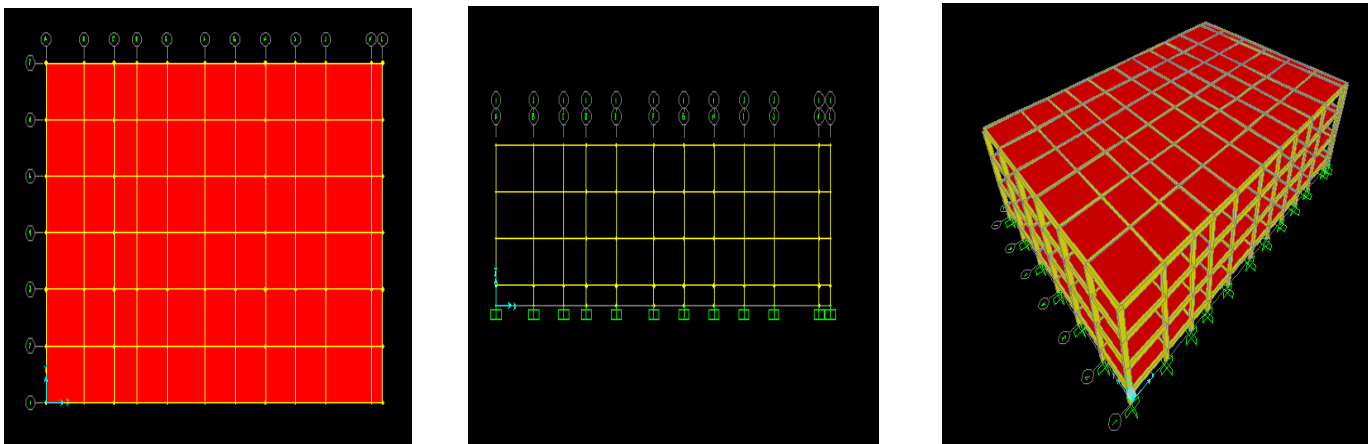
Plan, Elevation and 3D View (MODEL 1)
